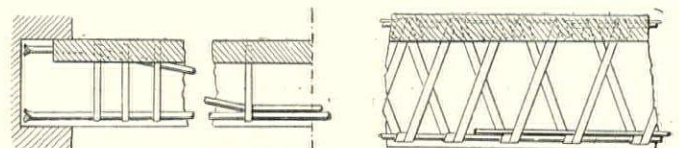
LONGITUDINAL SECTION THROUGH A HENNEBIQUE BEAM.
